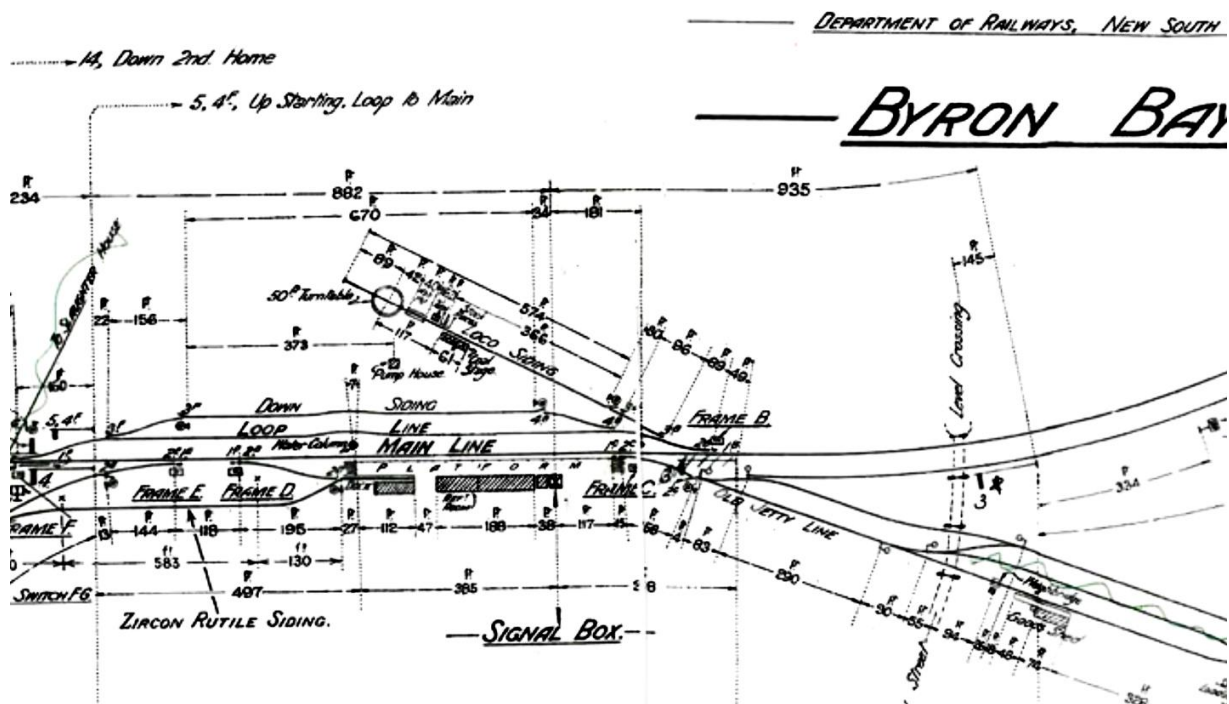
Extract from Byron Bay Signal Layout plan circa 1934. This plan shows a pump house between the station and the Loco Siding, although the dimensions do not match those shown on the original plan in Figure 42 above. (Source: Sydney Trains).
